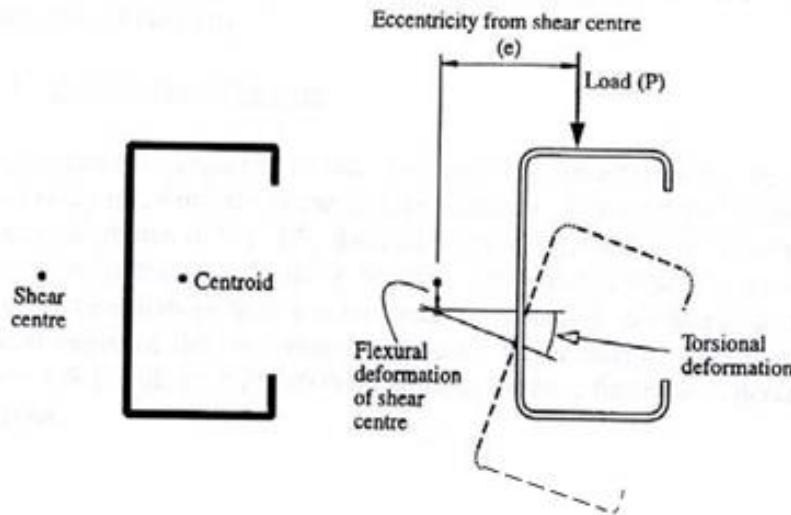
Torsional Deformations in Eccentrically Loaded Channel Beam
